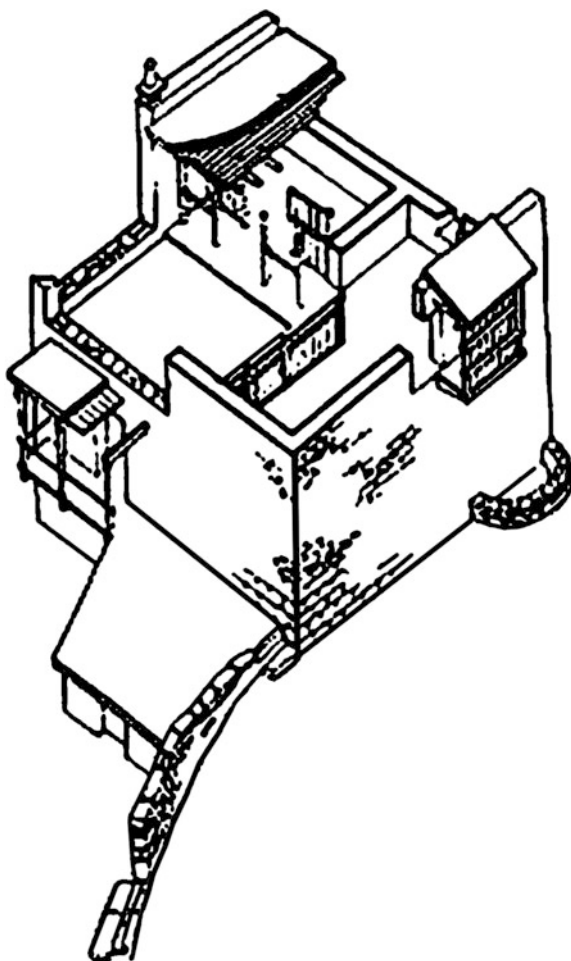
The front elevation of the Zeke House in Longsi Aba Tibetan Village appears to be built in the shape of a trapezoid, which provides a solid building structure. There are windows on the second and third floors but no windows on the ground floor, thus allowing the house to retain heat. *Source* Sichuan Province Construction Commission (1996: 167)
